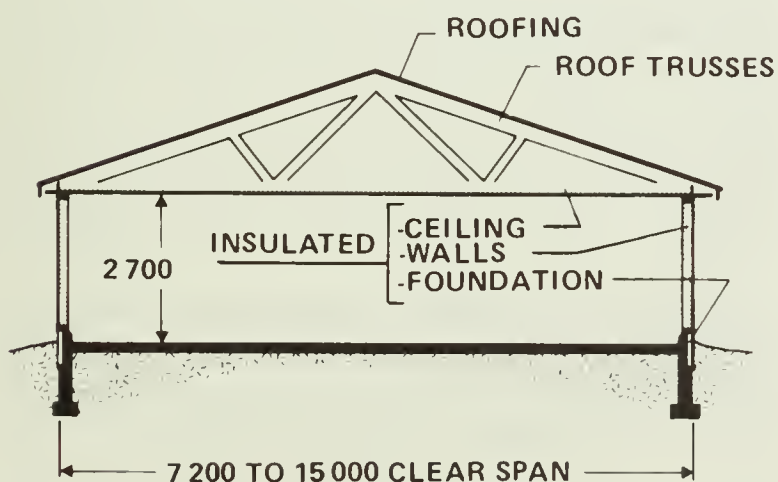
Single-storey insulated construction with clearspan trussed roof.
